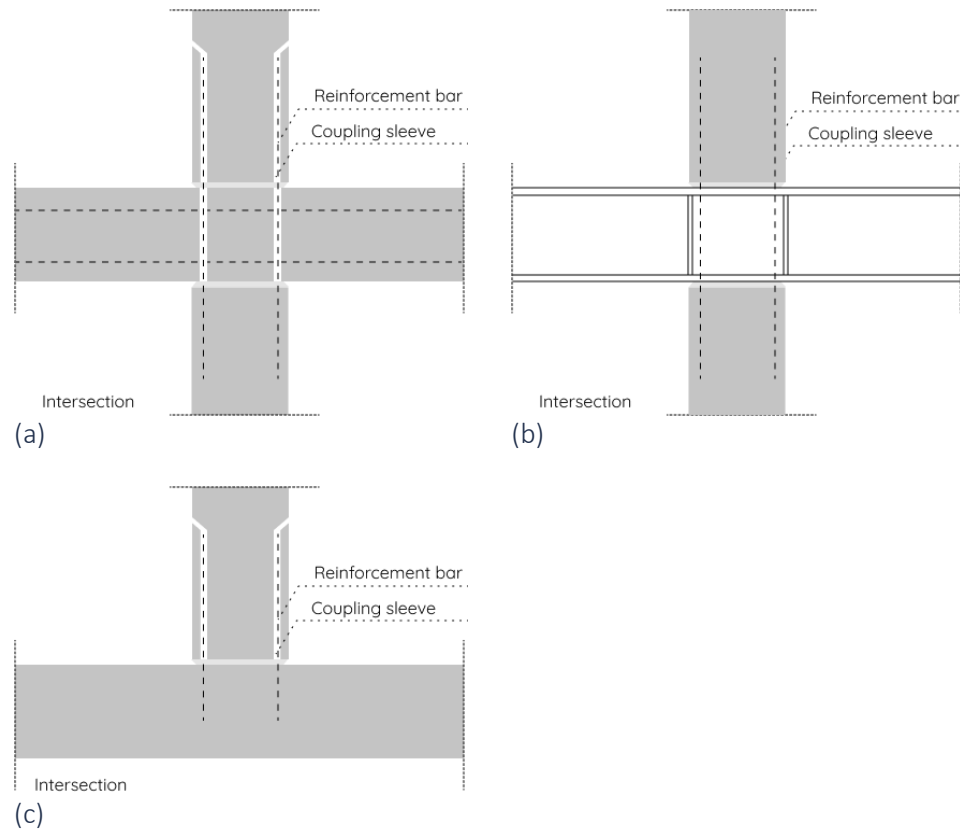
Example connections with coupling sleeves filled with mortar. A) prefab column - steel beam. B) prefab column – beam. C) ground floor – prefab column.
